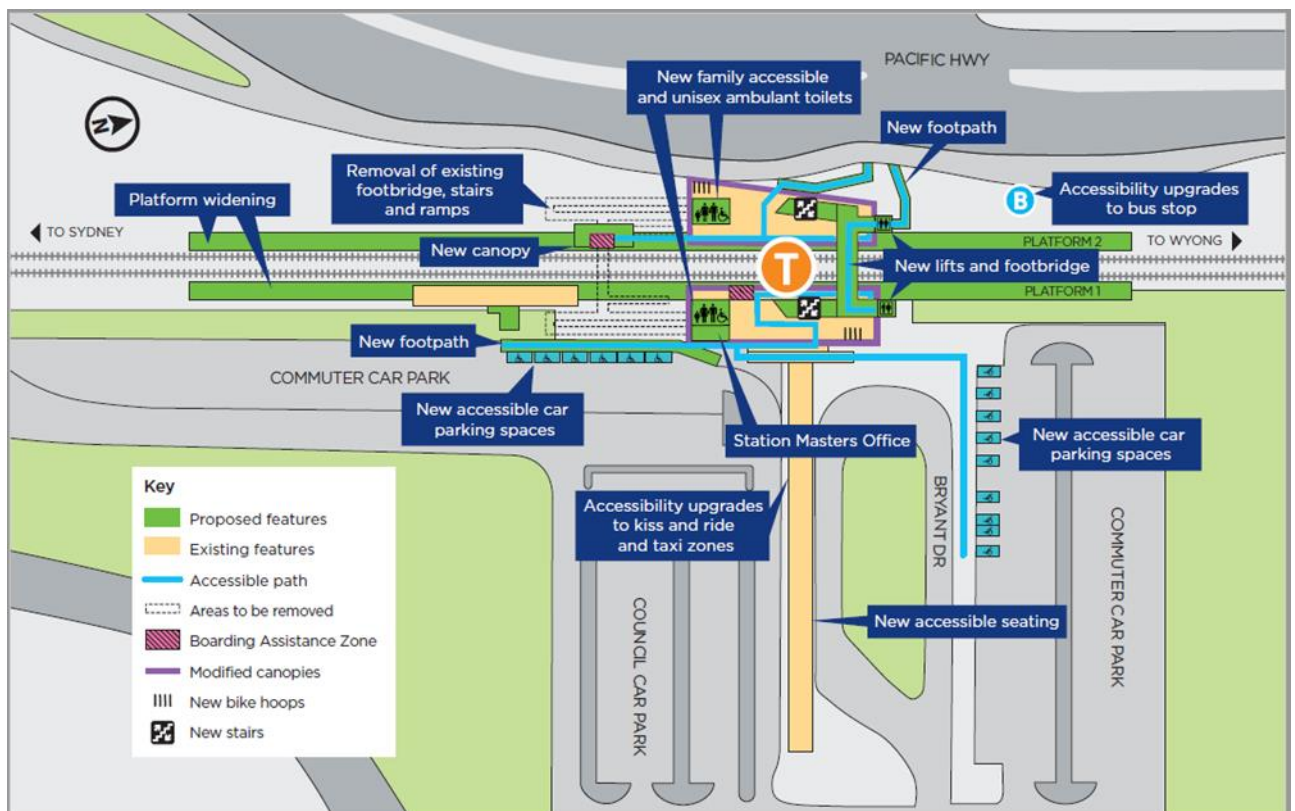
GENERAL LAYOUT OF THE PROPOSAL (INDICATIVE ONLY, SUBJECT TO DETAILED DESIGN)
